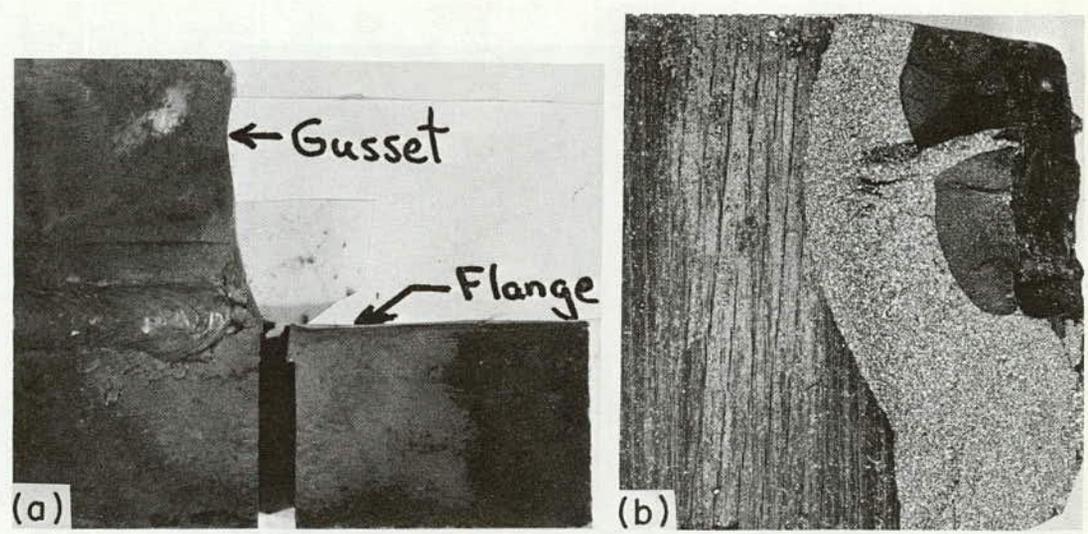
Flange gusset detail and exposed surface (beam 15, $r = 0$ in.).
